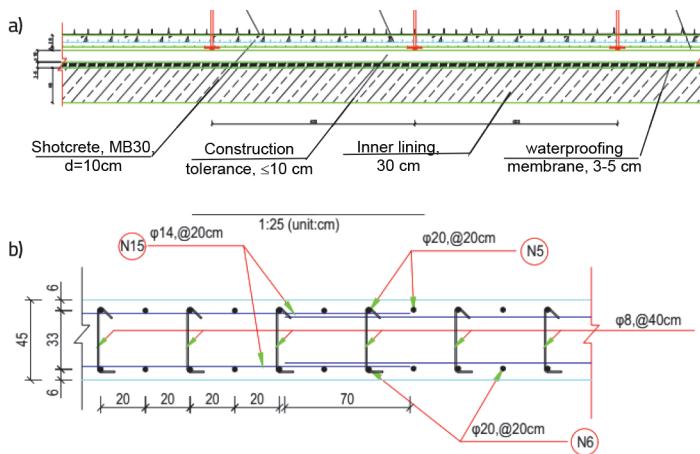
Secondary tunnel lining: a) plain concrete $d=30$ cm, b) RC lining $d=45$ cm
